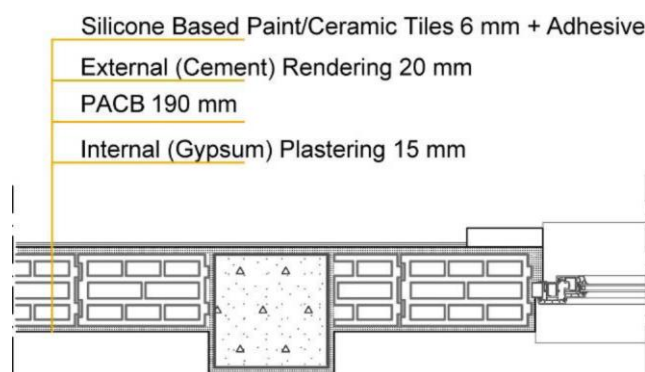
Plan detail of the external wall interface showing the RC column, the PACB infill, and the window frame (source: author).
